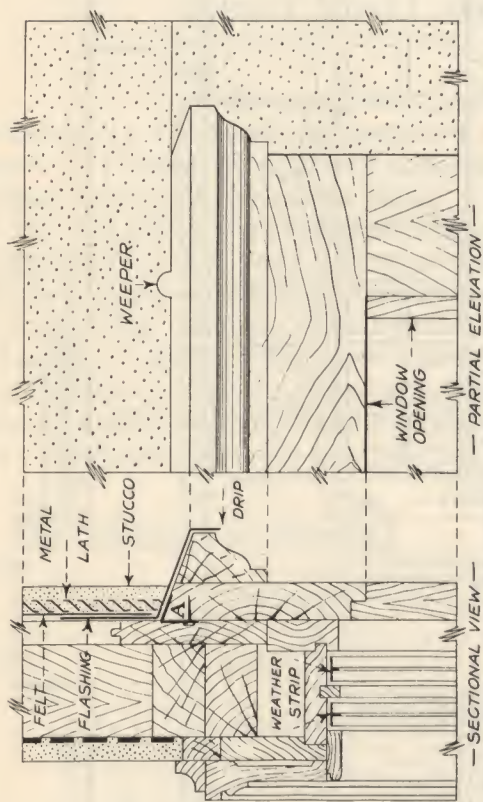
FLASHING WINDOW HEAD ON METAL LATH AND STUCCO WALL — SCALE $1\frac{1}{2}'' = 1'-0''$
